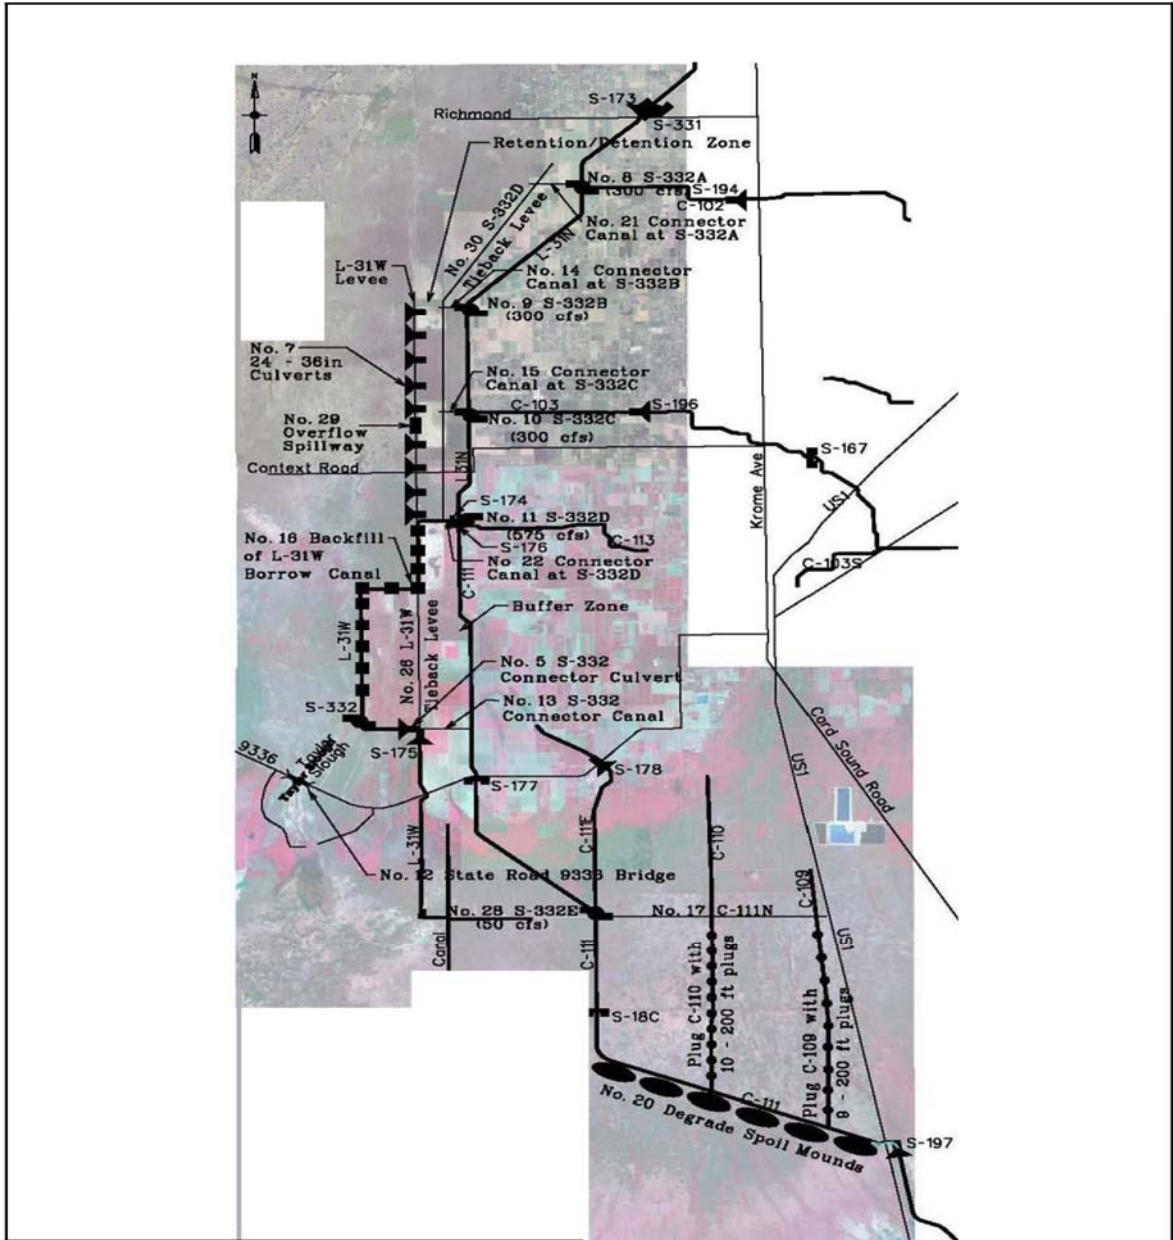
Alternative 2 - 1994 GRR Plan, backfill down to S-332 in L-31W, west-discharging culverts, and an overflow spillway along the west side of the SDA
